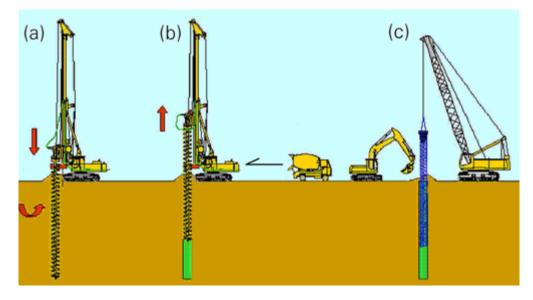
Continuous Flight Auger Pile Installation (source: Bauer Maschinen)
